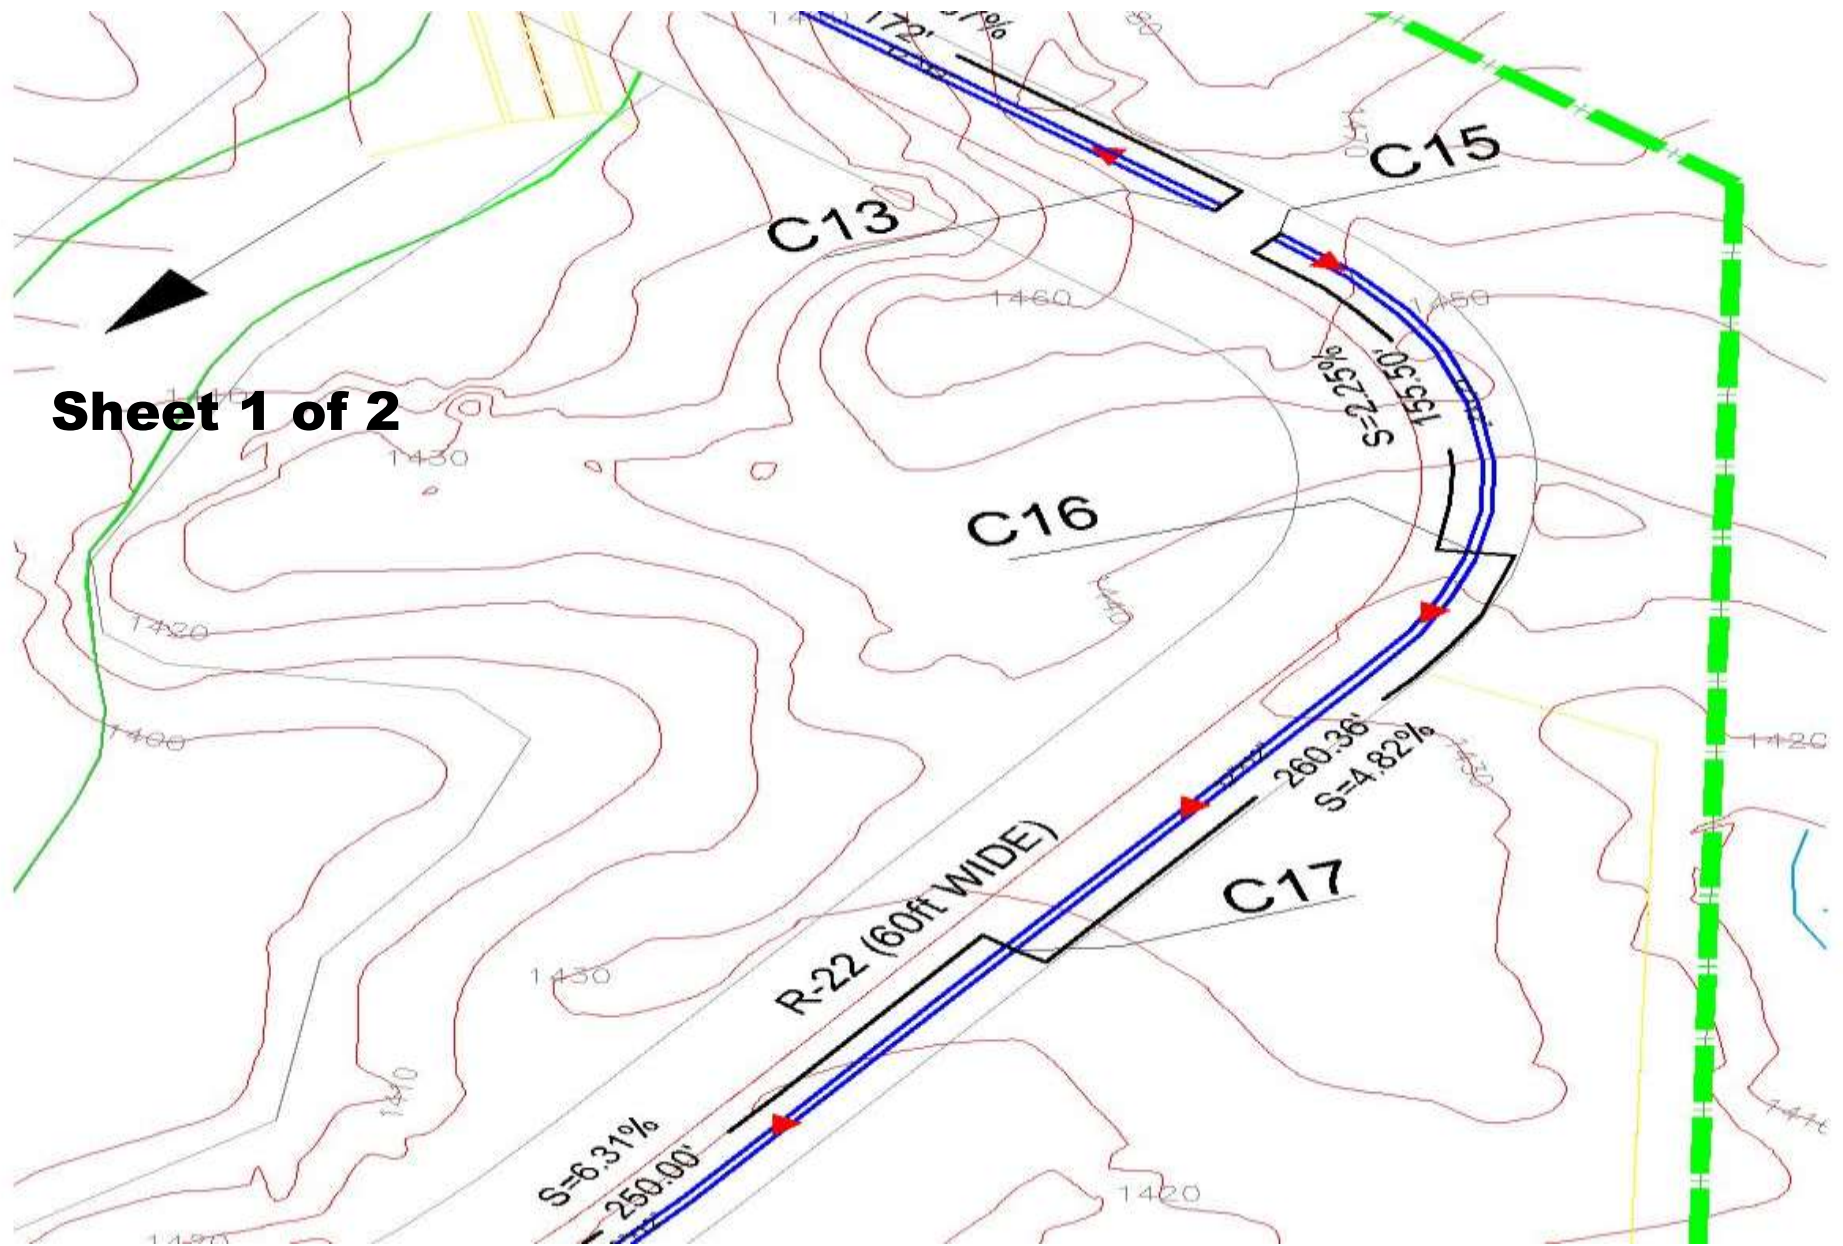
Storm drainage layout plan of Sub-catchment-16 showing initial node C15
